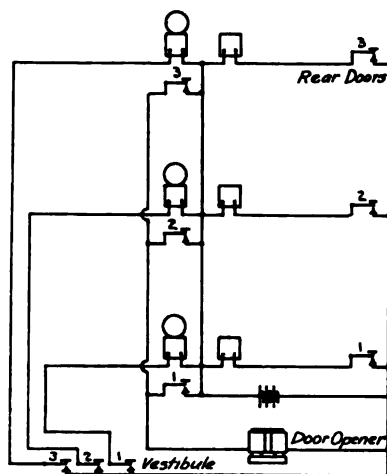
APARTMENT HOUSE BELL SYSTEM.
